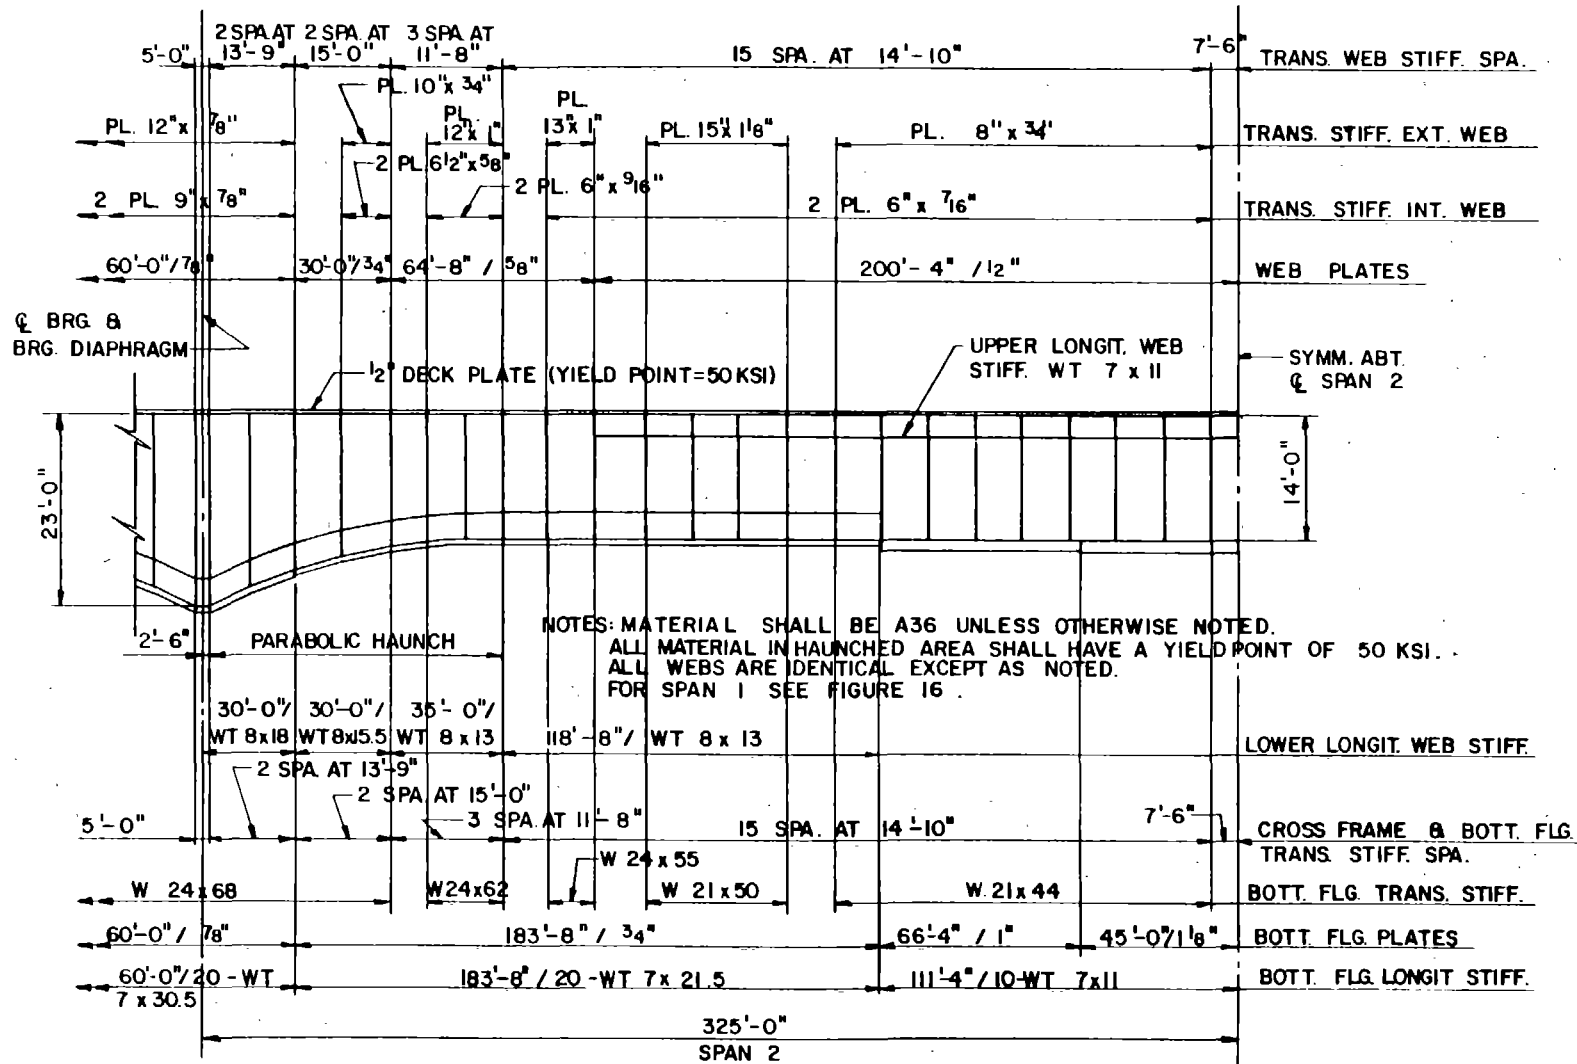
INTERIOR ELEVATION OF GIRDER WEB - AASHTO DESIGN - LONG SPAN
